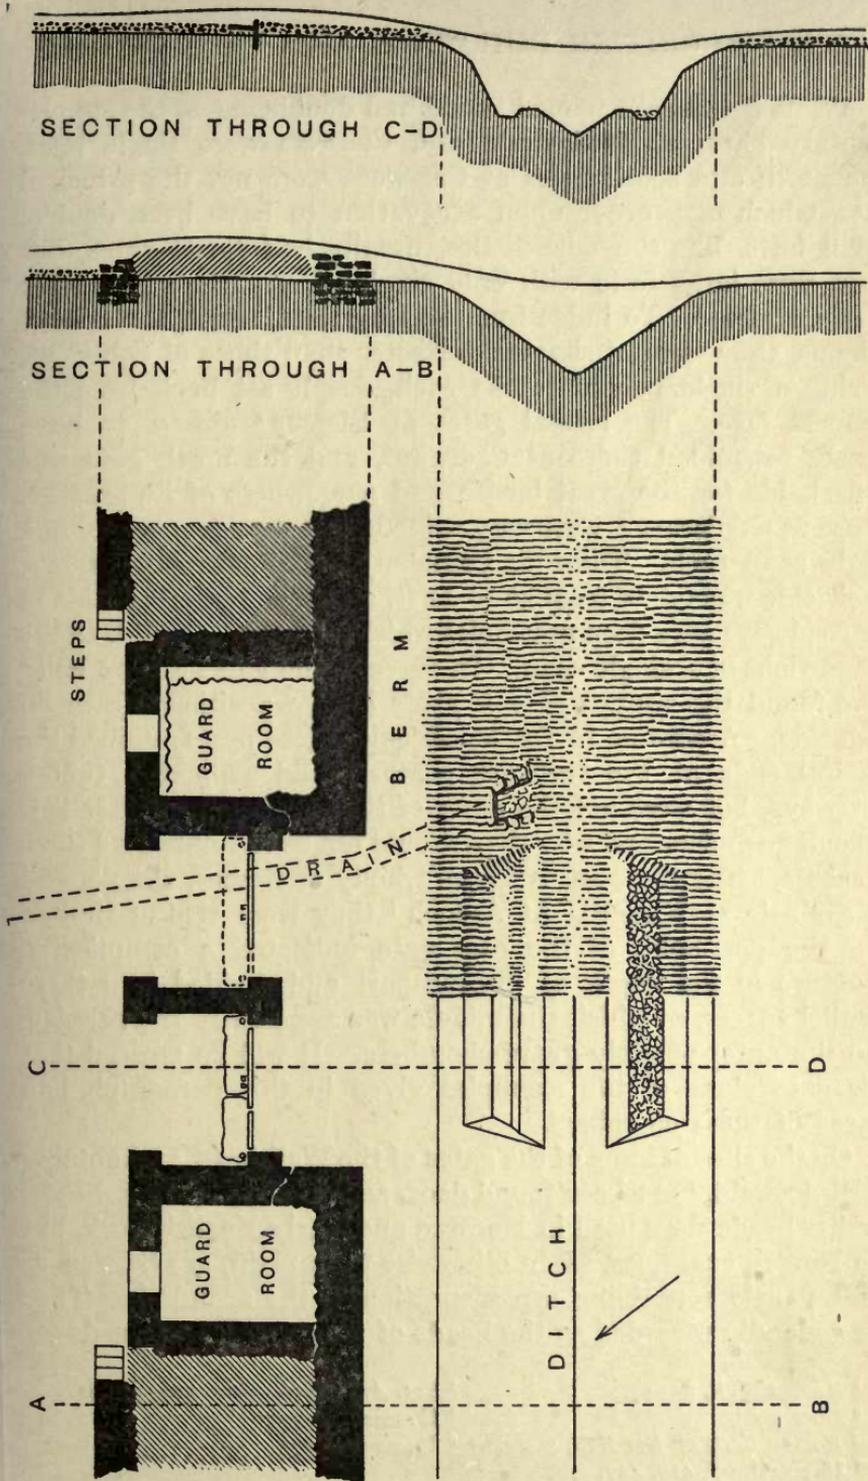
Plan of South-west Gate and Ditch with sections, Gellygaer. (15 ft. to 1 in.)
